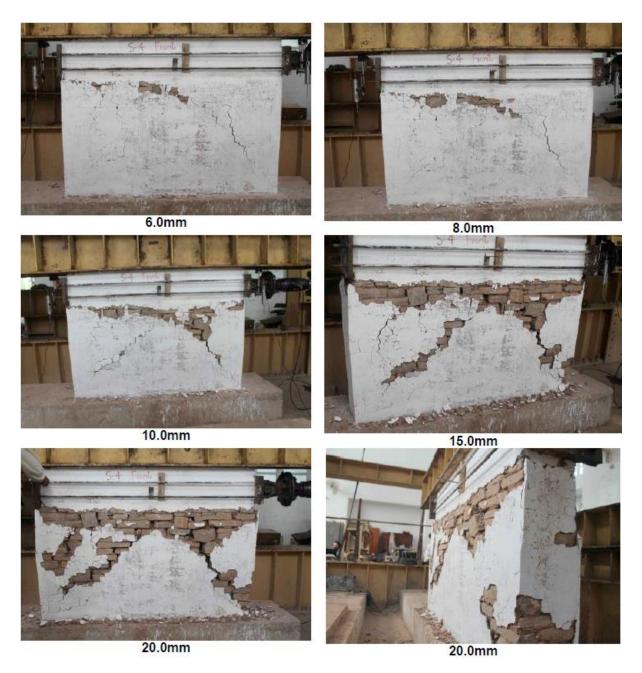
Damage evolution of the stone masonry wall under in-plane quasi-static cyclic load - No Containment
